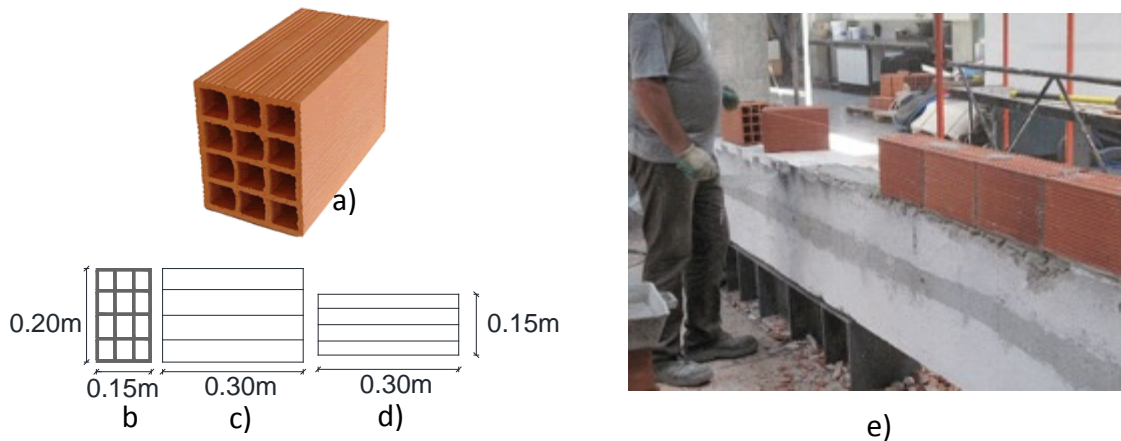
Masonry brick type a) General view; b) Transversal section dimensions; c) lateral dimensions; d) top dimensions and e) Construction process of the IM wall.
